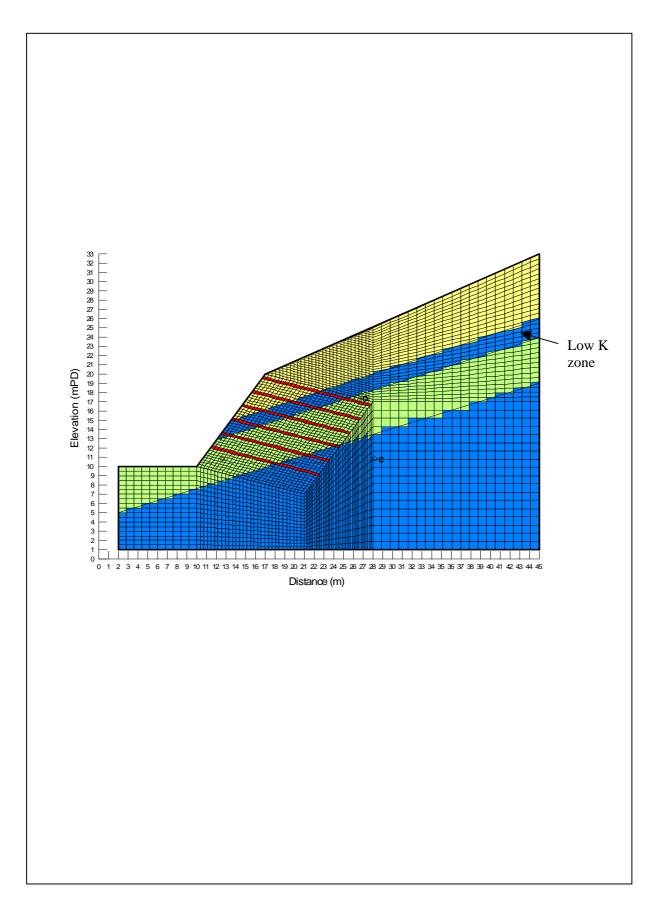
(Model 7) – Soil Nails and Mesh System in the Layered Slope with Thin Zone of Low Hydraulic Conductivity
